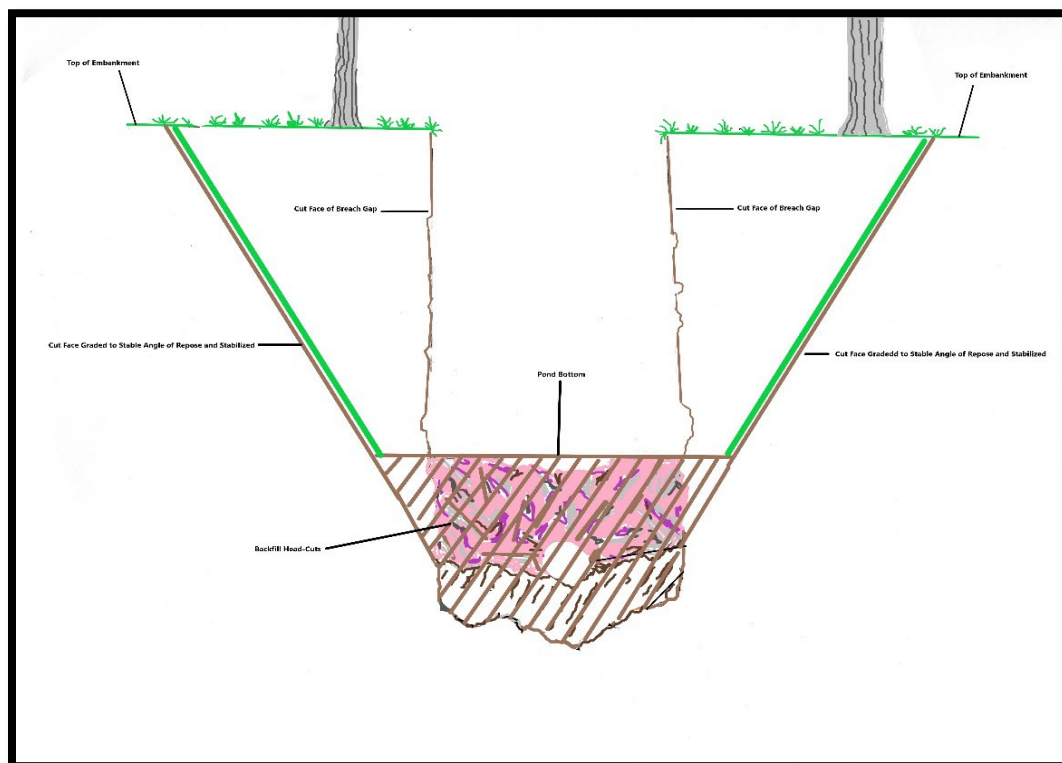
Cross-Section Concept for Stabilization of Embankment and Head-Cuts
